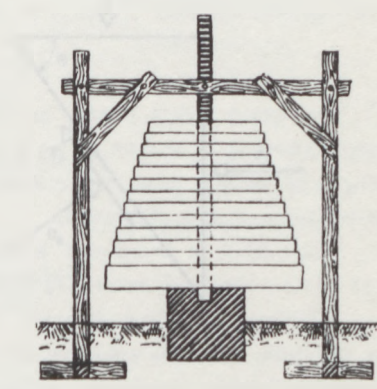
Diagram of the mechanical assembly shown in the drawing.
